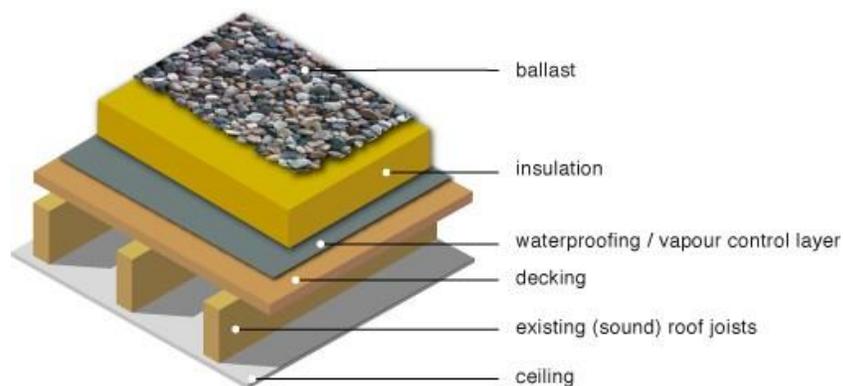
Inverted warm roof insulation (Source: www.greenspec.co.uk buildingdesign).
